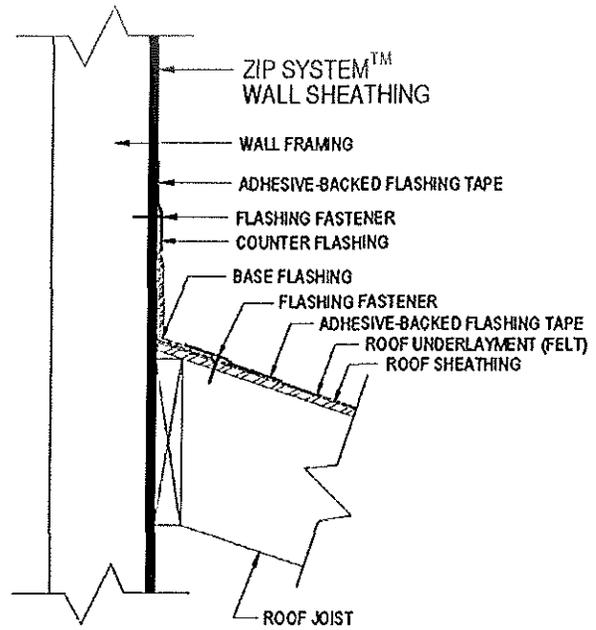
ROOF-WALL INTERSECTION (OPTION 2)
